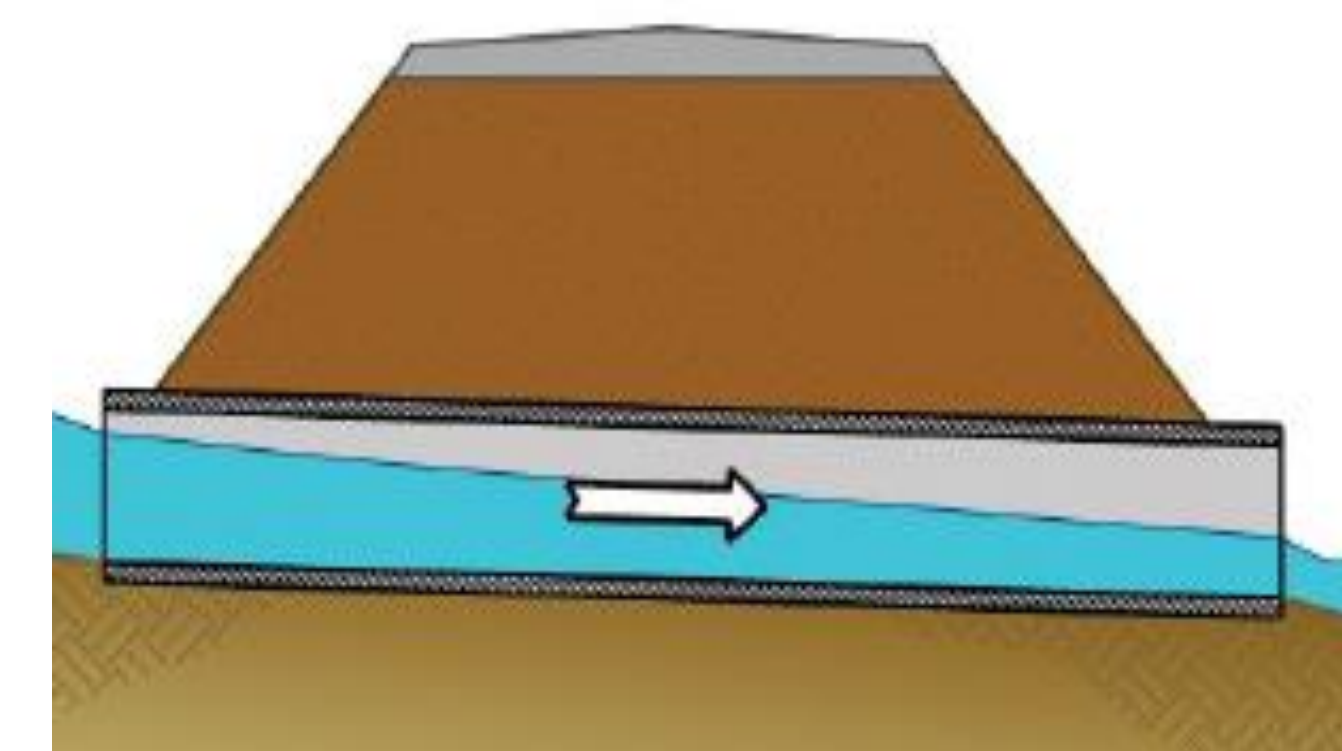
Submerged inlet (Hydraulic Design of Highway Culverts)
